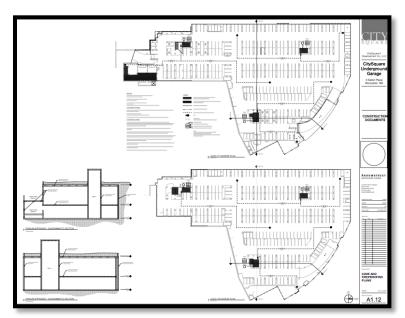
Architectural drawings by levels and elevations of the underground parking garage (Gateway)
